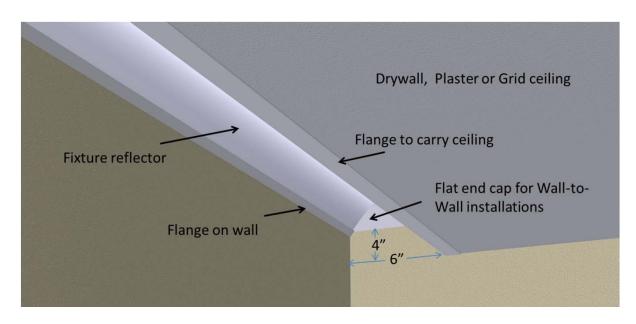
Detail B. Plaster rail is mudded into back wall, ceiling material is rested on fixture's visible flange. Fixture is shown butted against side wall.
